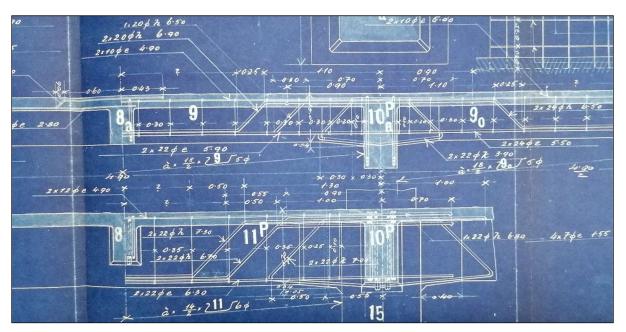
Reinforcement details of a secondary (above) and primary beam (below) – above the column in longitudinal direction (bars are labeled as: *e*. – straight, *h*. – bent) [5]
